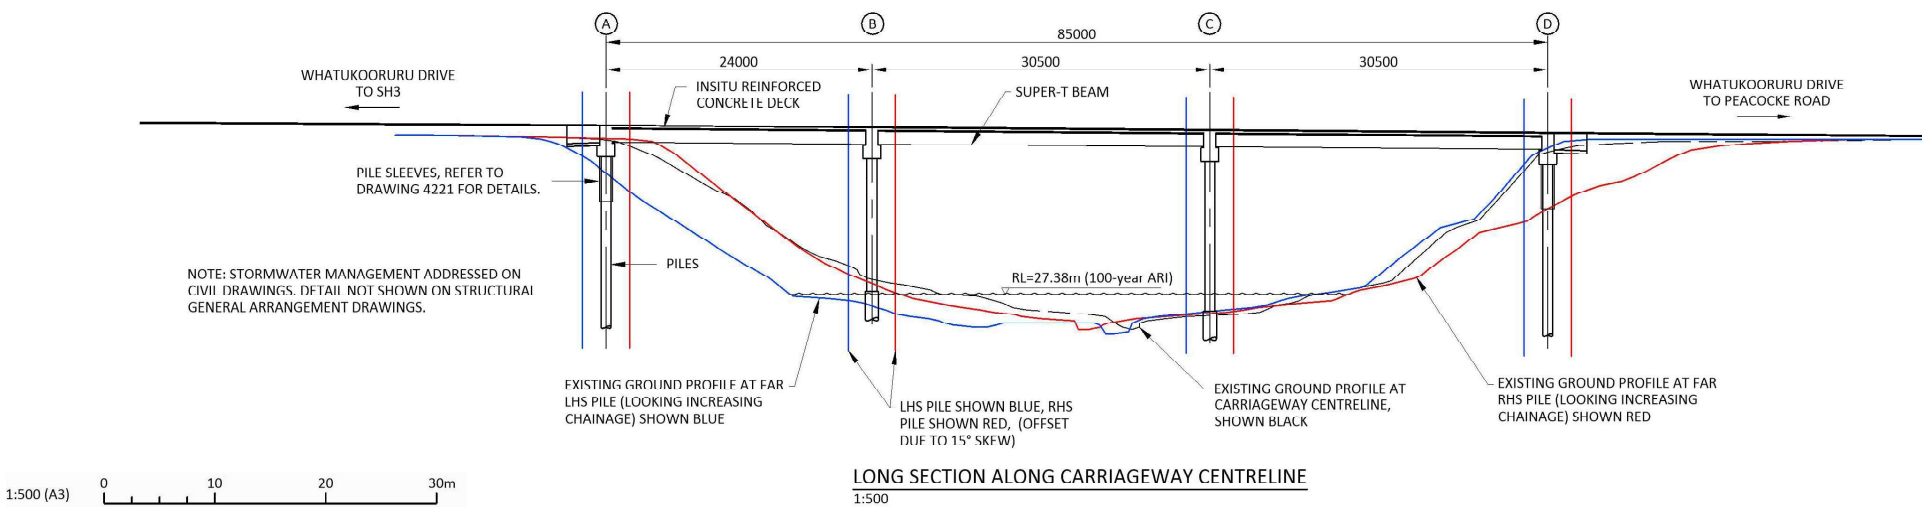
TYPICAL BRIDGE ELEVATION
